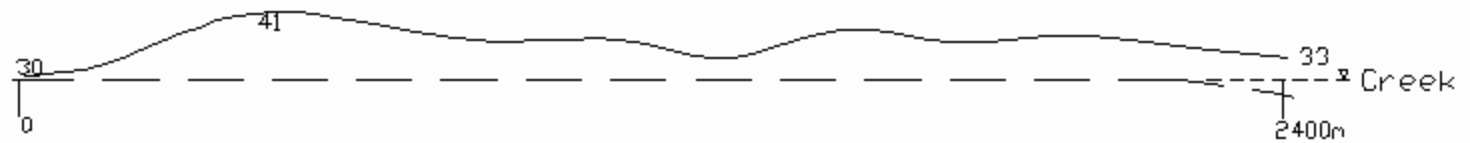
SECTION OF EXISTING WASTE DUMP ALONG C-D-E
